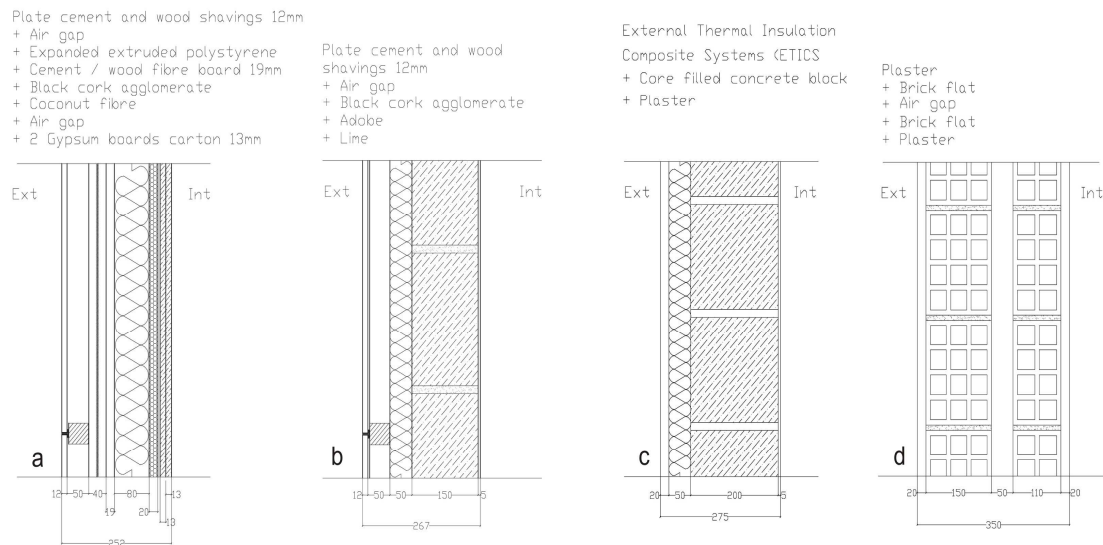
Proposed walls: a) Natural fibres lightweight wall, b) Natural fibres heavyweight wall. Conventional wall: c) Simple Wall of the 90's decade; d) Double Wall of the 80's decade.
